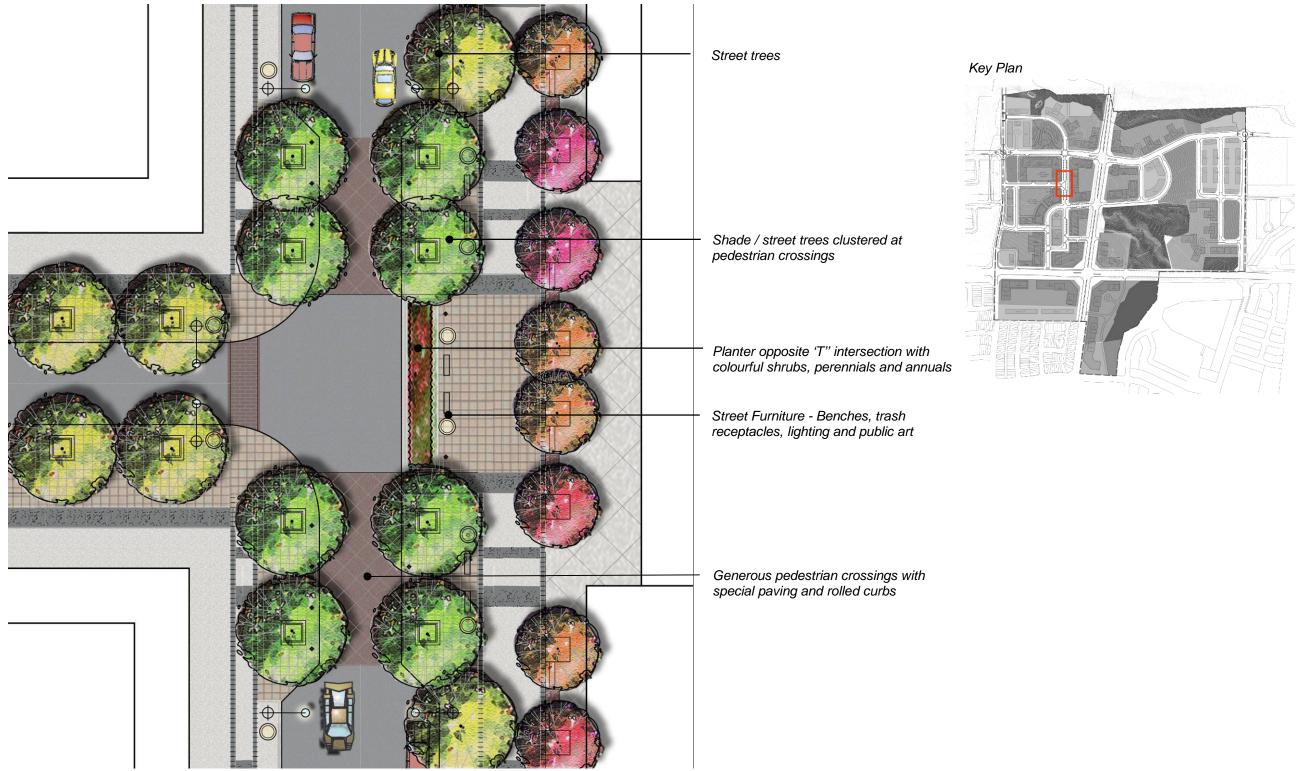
Detailed Plan of Main Street at Midblock 'T' Intersection
